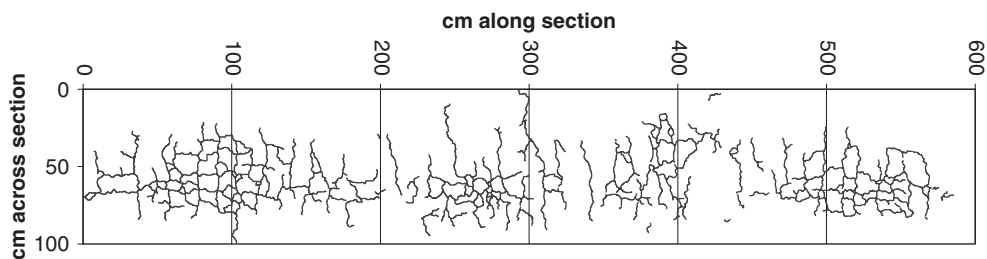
Fatigue cracking on one section after Phase 1 HVS testing.
